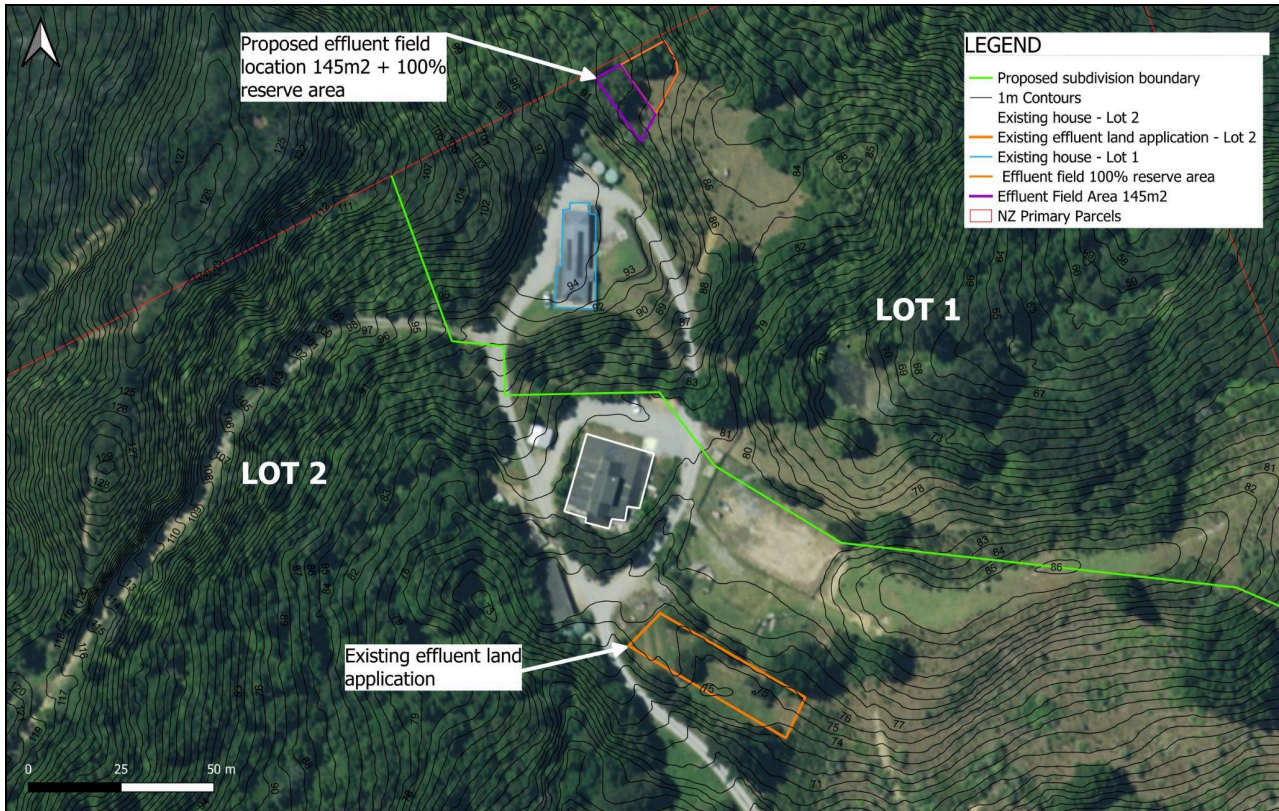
Site Plan (Scale 1:1000. LINZ Aerial Imagery with 1m contour overlay and proposed subdivision plan supplied by *Williams & King*, dated Jan 2024).
